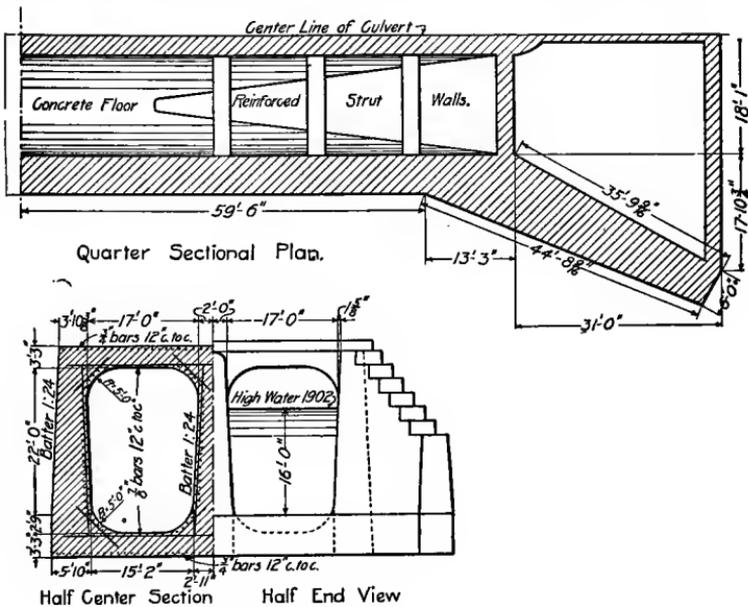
C. B. & Q. DOUBLE BOX CULVERT.
